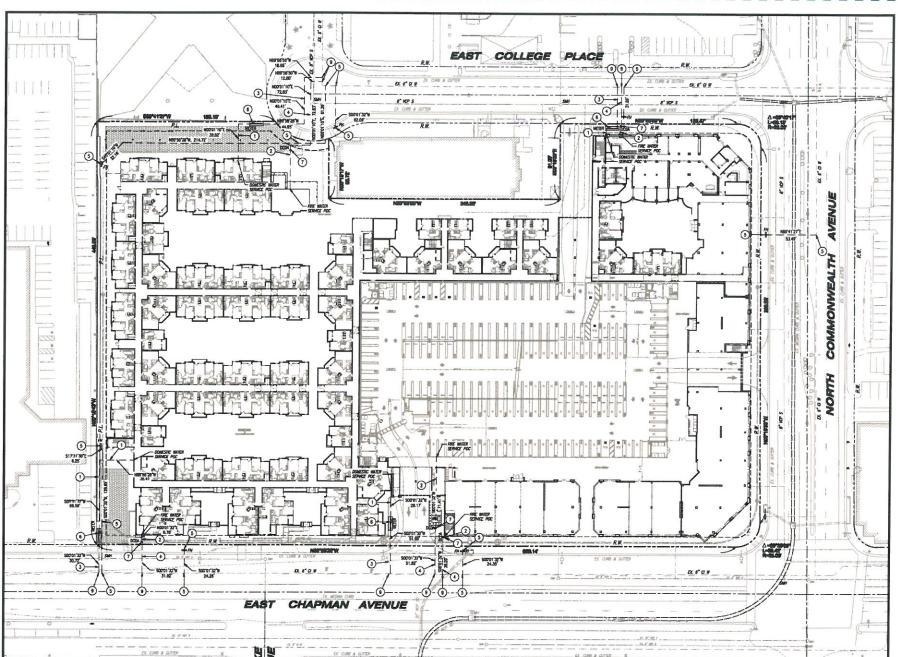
Conceptual Water Facilities Improvements Plan
